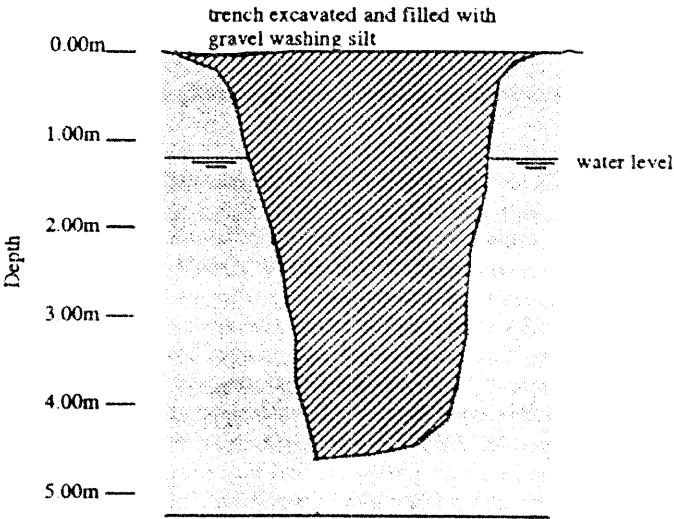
Test trench excavated by mechanical shovel with gravel washing silt instead of bentonite
